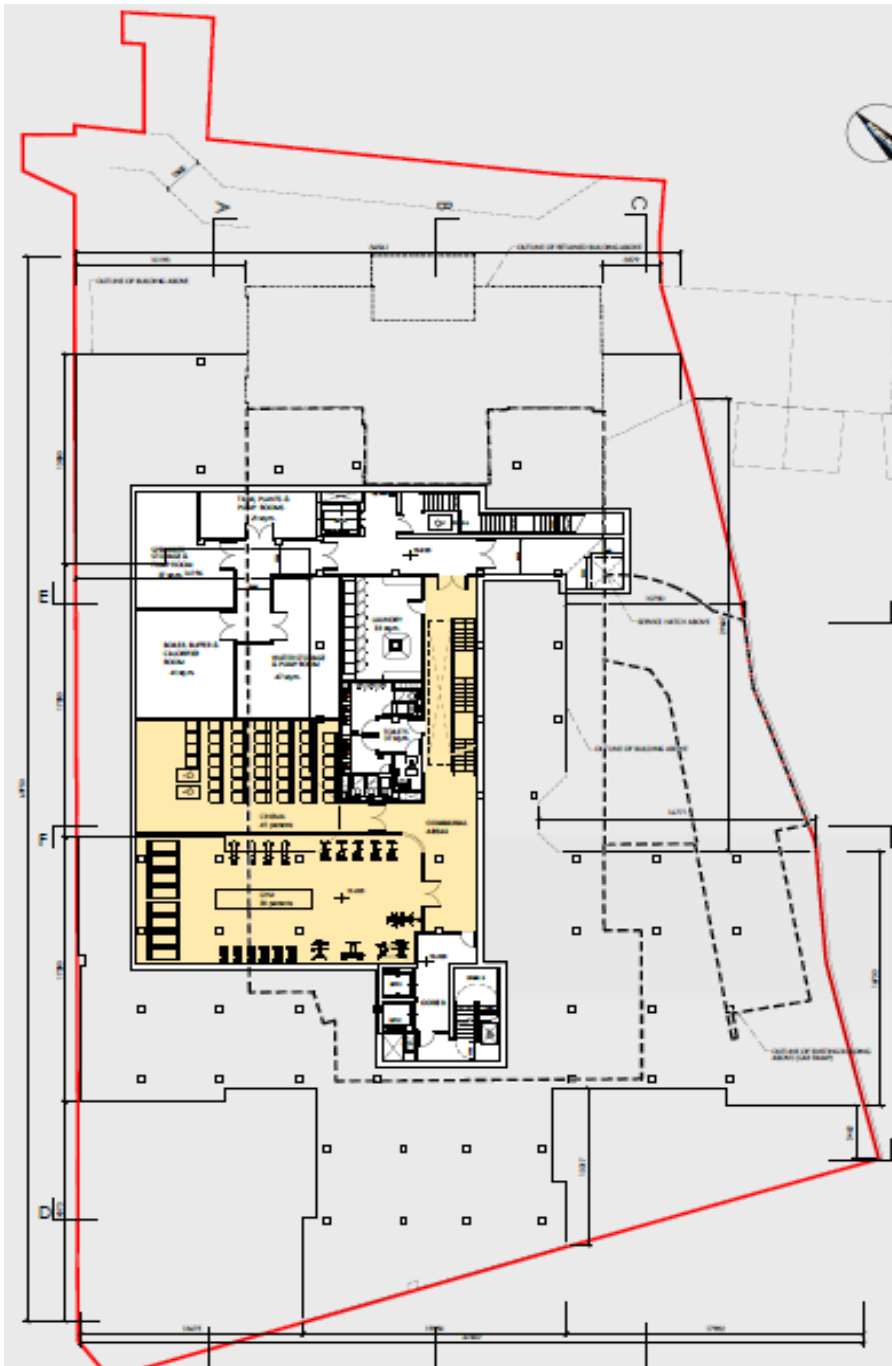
Architectural Lower Ground Floor Plan Lvl. -1
